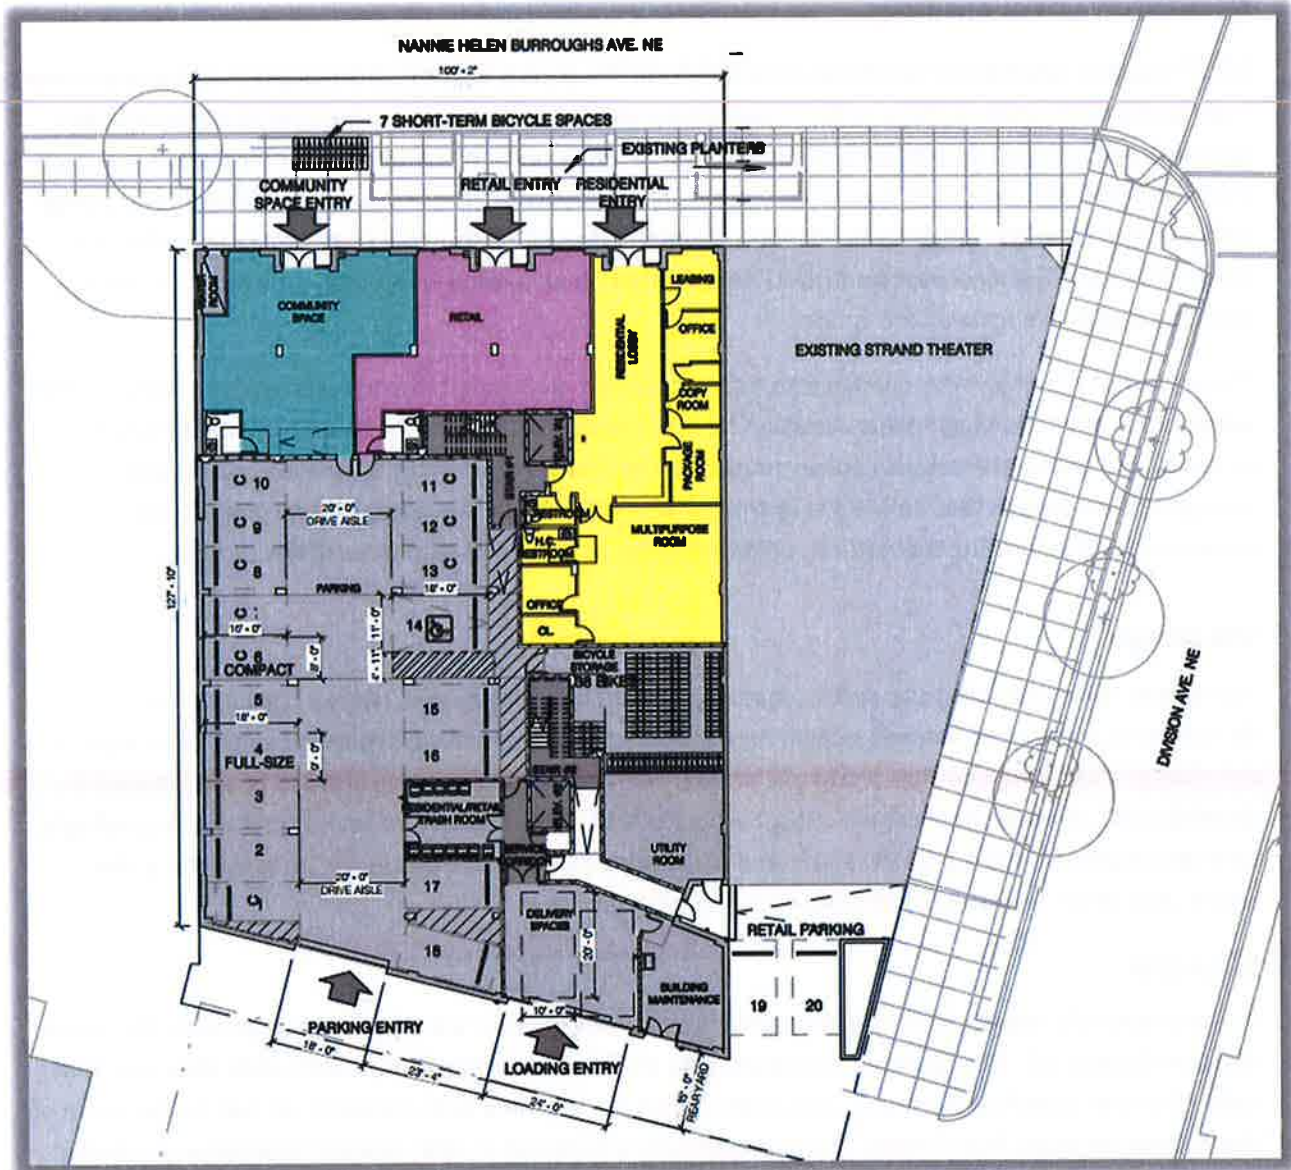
Site Plan (Source: Applicant Plan Set, Sheet A-09, 10/26/17)
